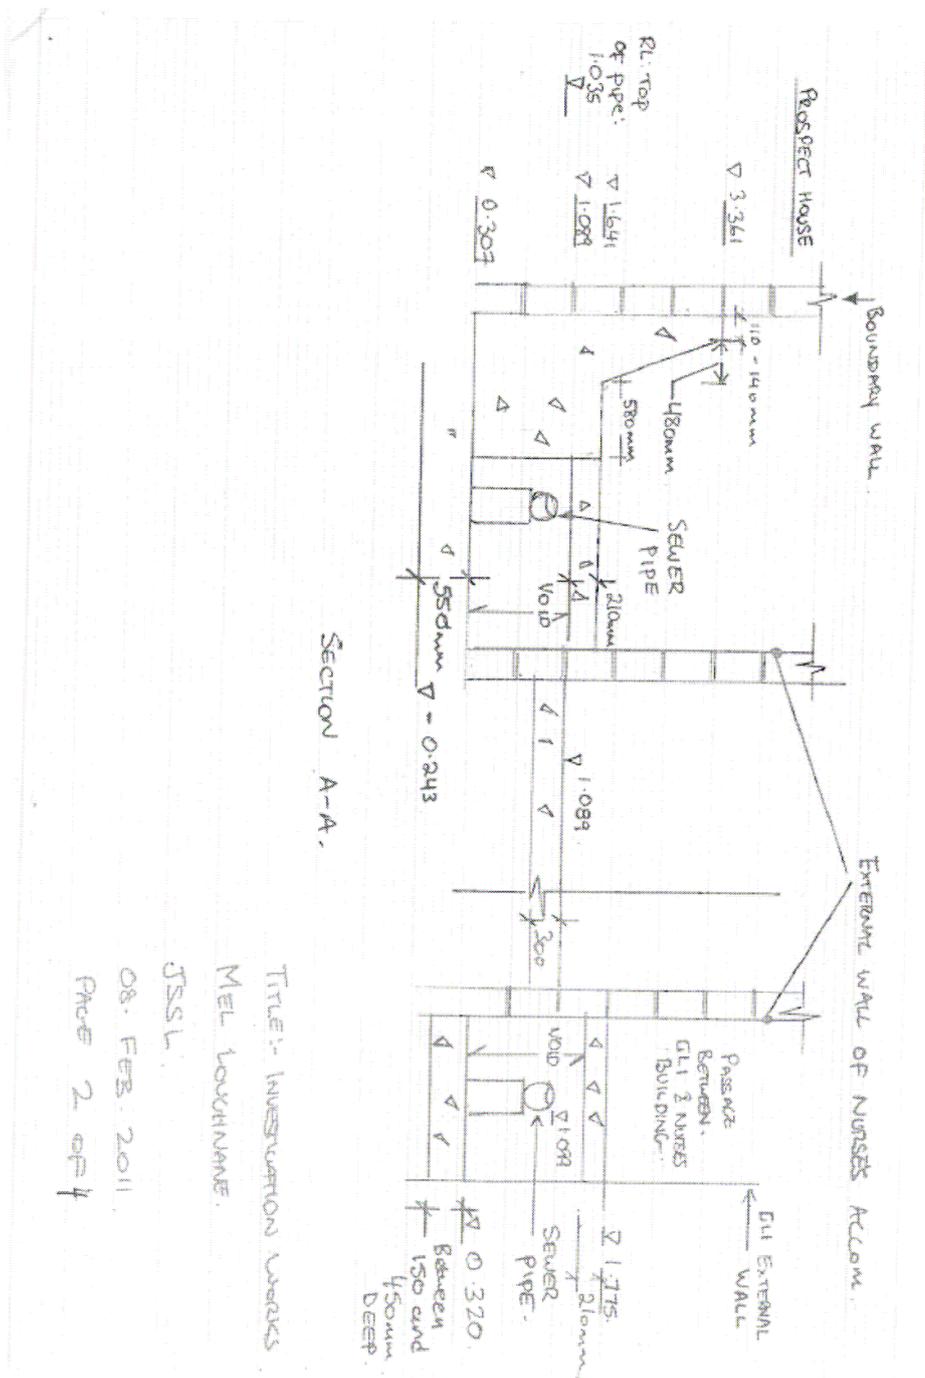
Section A-A. The slab profile north to south across the site. This details the external 210mm thick slab (between Prospect House and the site). This is the roof of the service ducting, which runs between the two buildings. The base slab thickness of this is 550mm. It also shows the internal higher level slab of 300mm thick with a Top of Slab (T.O.S) RL : 1.089. Also included here is the 210mm thick slab between the site and the General Lying-In Hospital building. The base slab thickness here varies between 150mm and 450mm. Added to each of the underside of slab measurements is the c200 to 250mm of loose concrete at the base of the cores. © John Sisk & Son Ltd. 2011.
